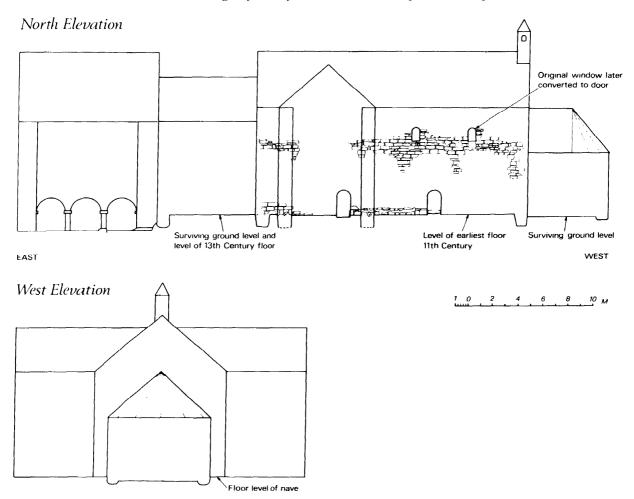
St Oswald's, Gloucester: reconstructed elevation of the 10th century church of Period 2; surviving wall not shown below floor level (drawn by Philip Moss)
